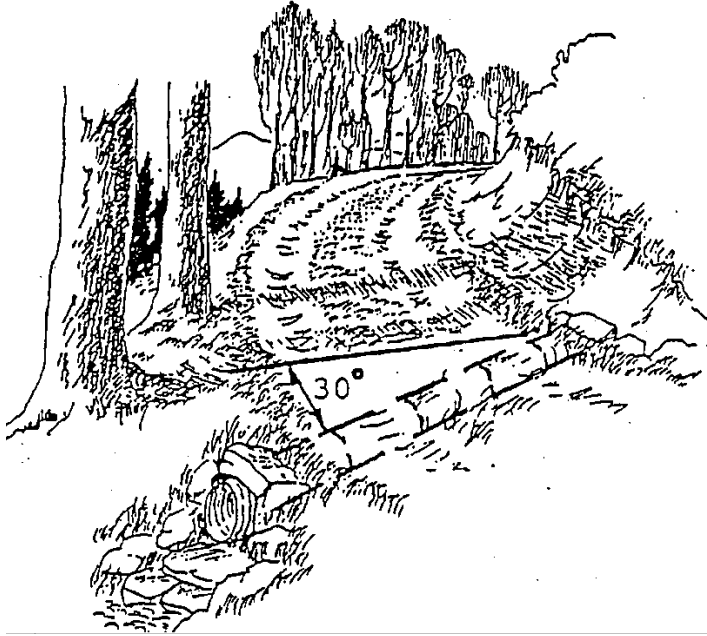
CROSS DRAINAGE CULVERT INSTALLATION
